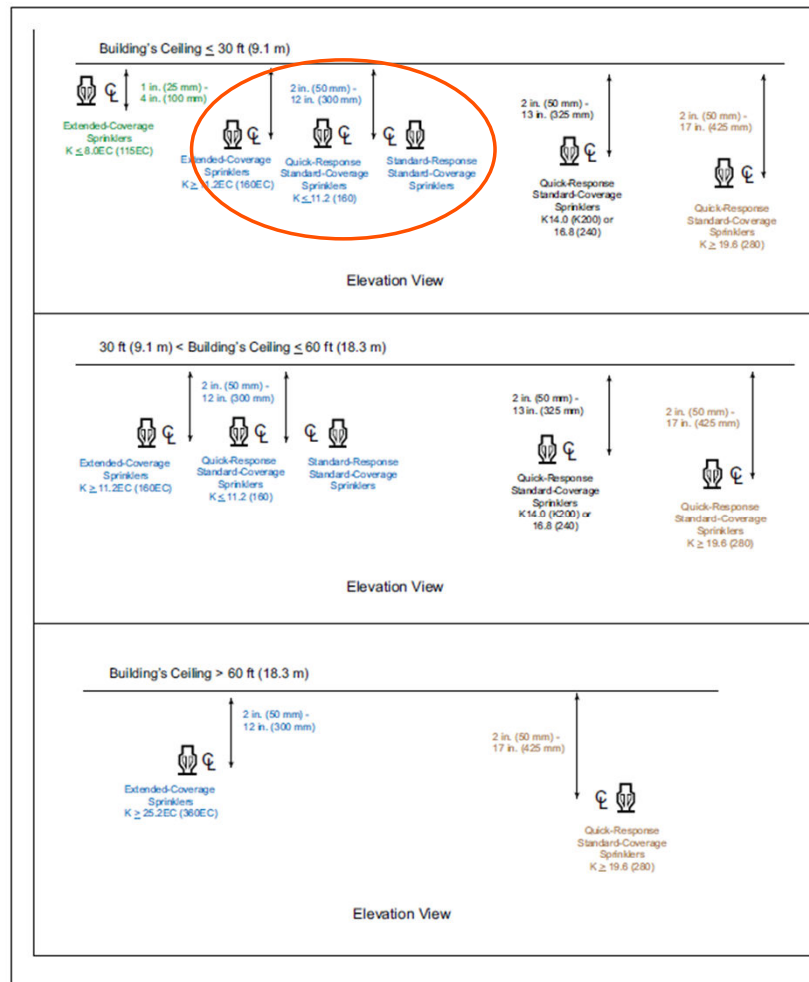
Vertical location of Nonstorage pendent and upright sprinklers under unobstructed ceiling construction for various ceiling heights
